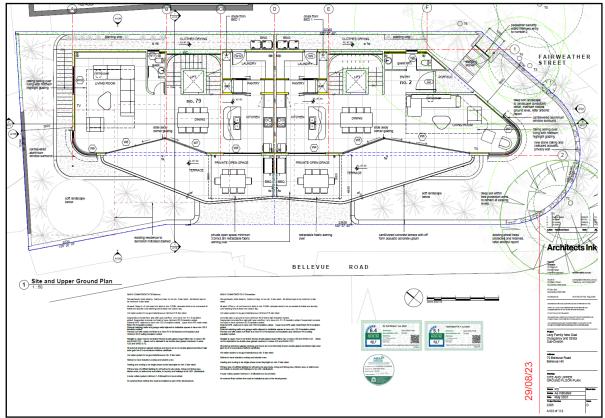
Site and upper ground floor plan. Source: Submitted Architectural Plan
